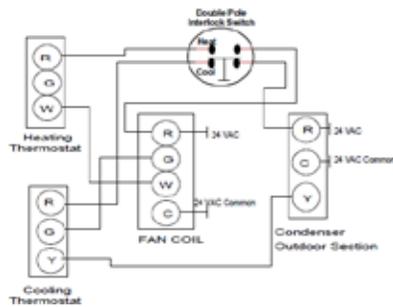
Heat/Cool Thermostat Connections - Separate Thermostats & Separate Transformers in Air Handler and Outdoor Unit
